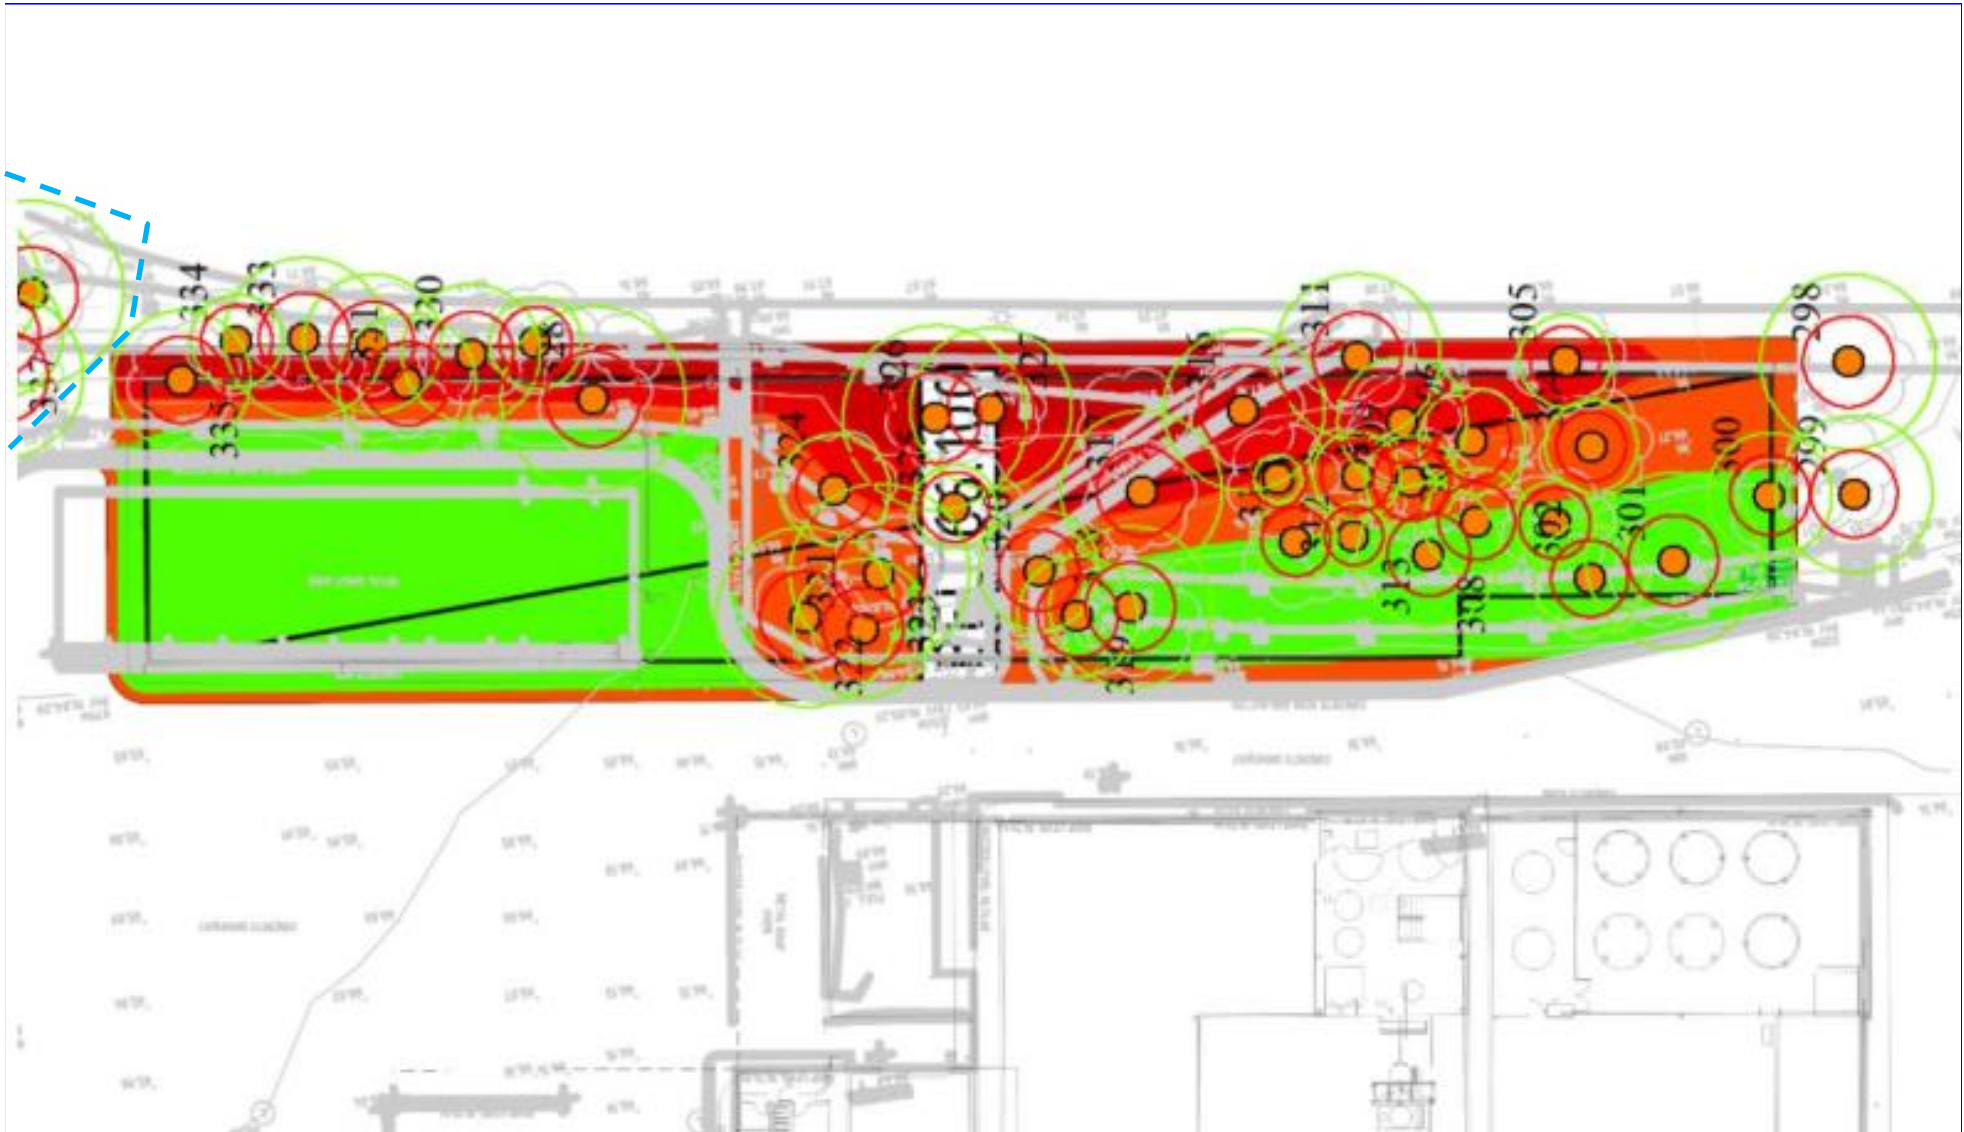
TPZ fencing (Blue) is to be installed around all trees to be retained.
